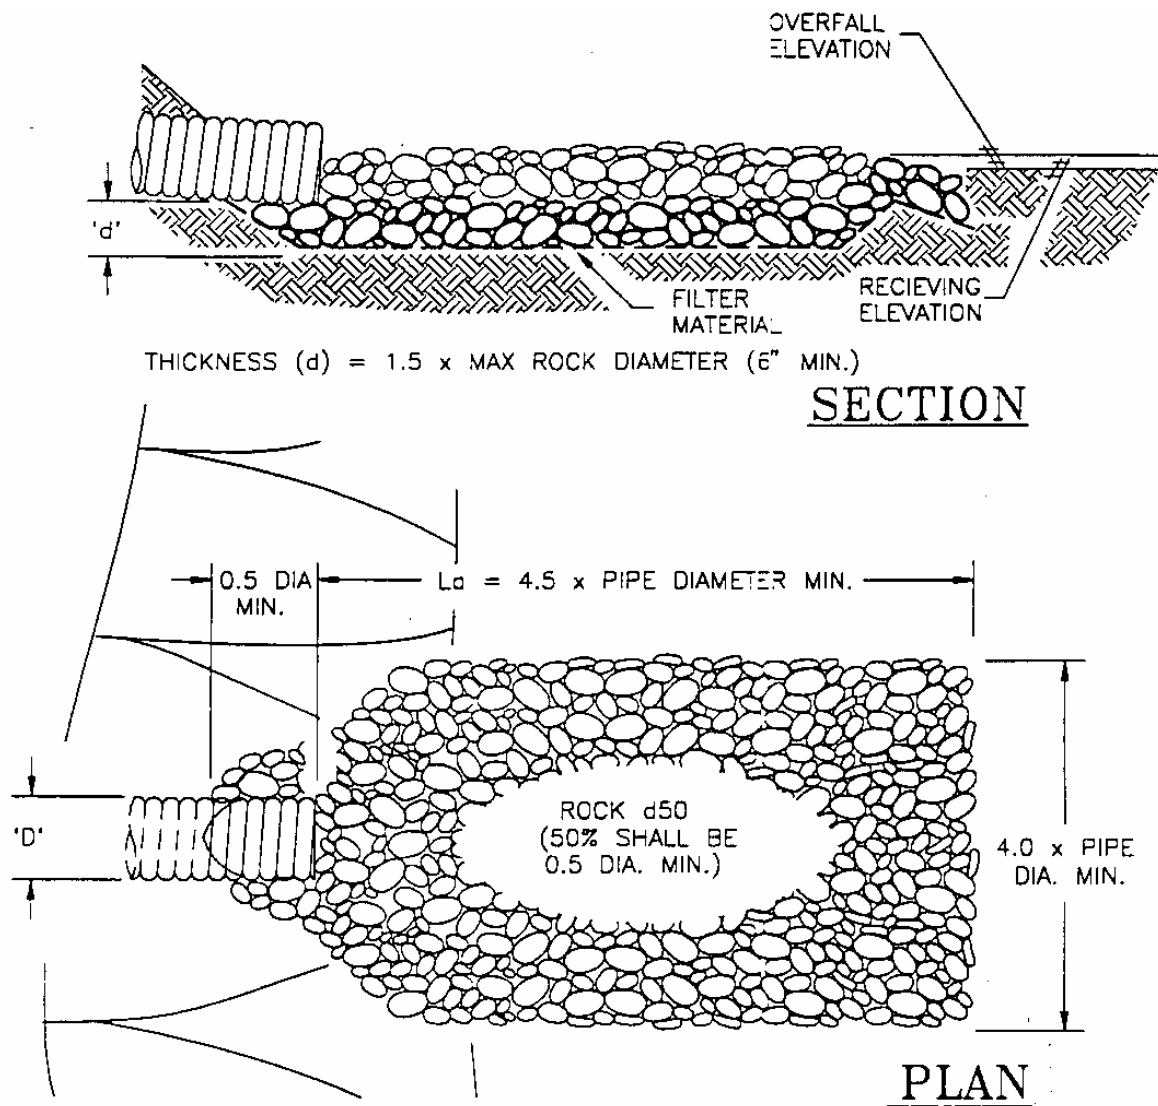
Like stream crossing culverts, ditch relief culverts should be installed at the base of the road fill, with armoring at the inlet and some type of energy dissipation at the outfall. If the culvert is placed higher in the fill, a downspout should be used to carry flow from the outlet downslope past the base of the fill.
